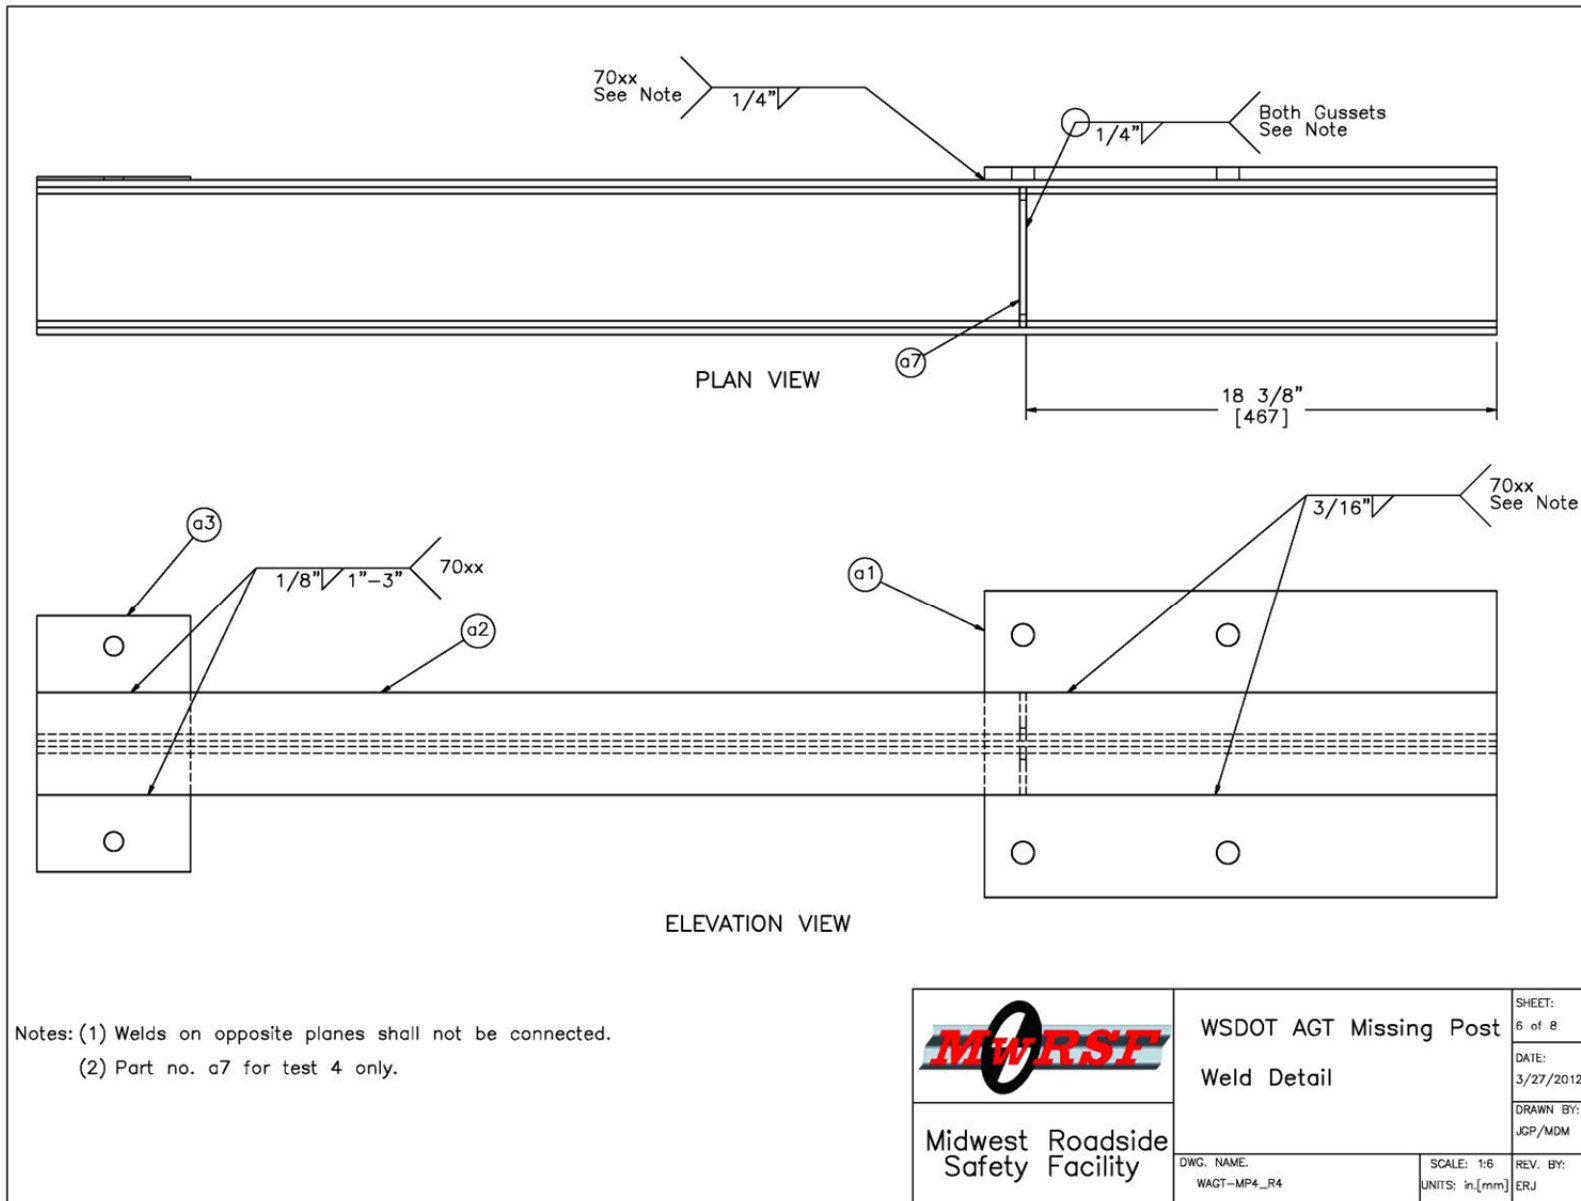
WAGTMP Bogie Testing Weld Details
